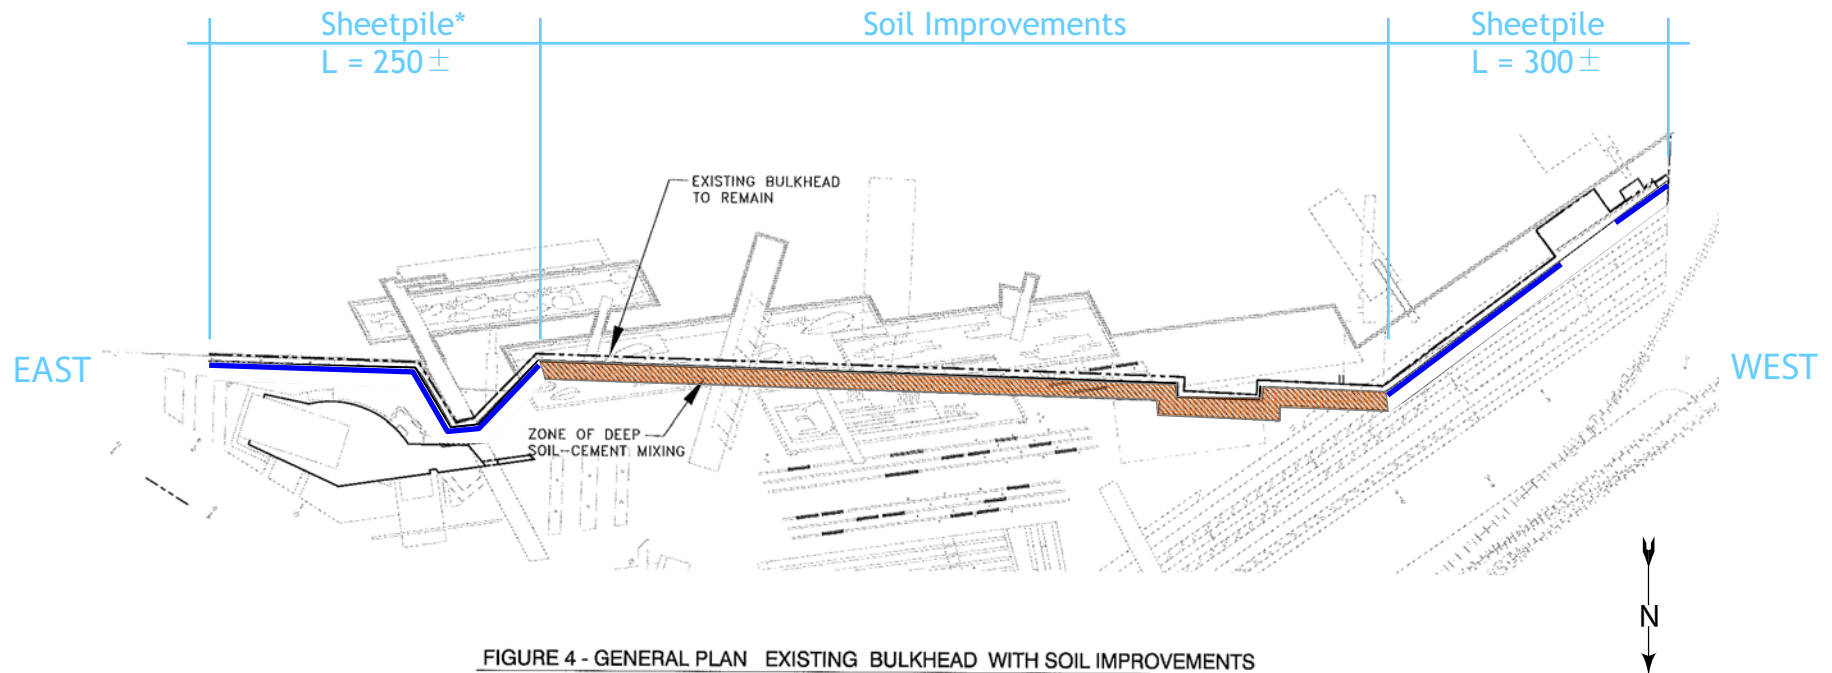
GENERAL PLAN EXISTING BULKHEAD WITH SOIL IMPROVEMENTS
